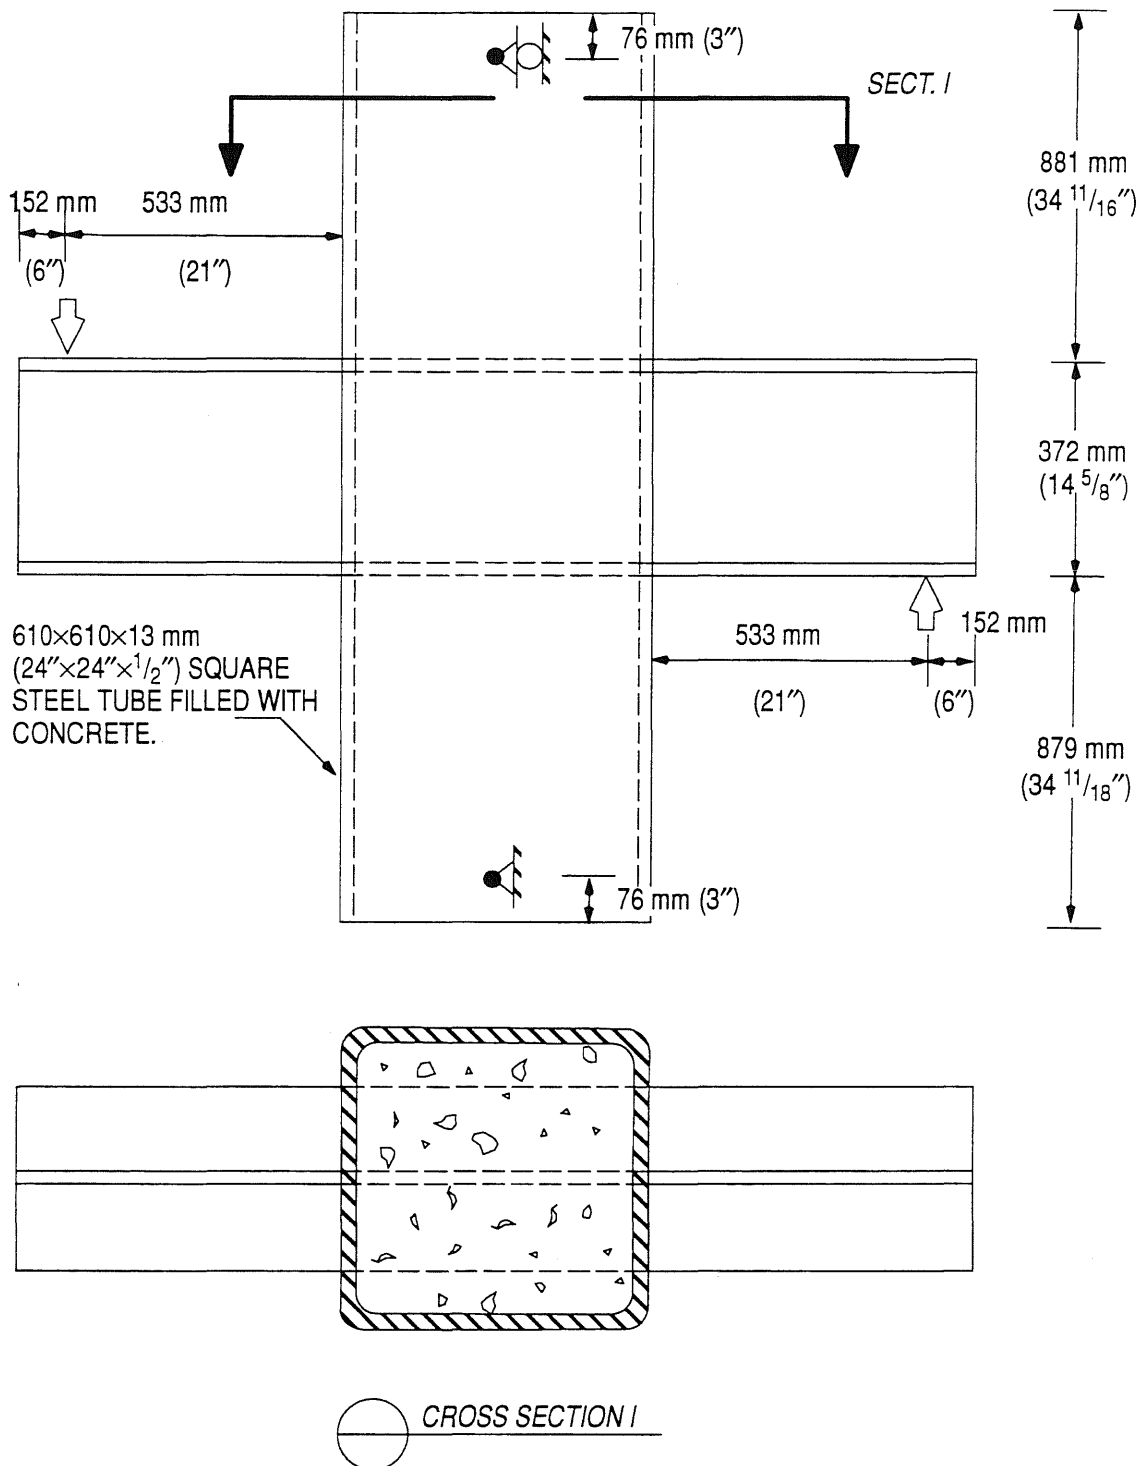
Test Specimen used by Azizinamini *et. al.* (1992)
